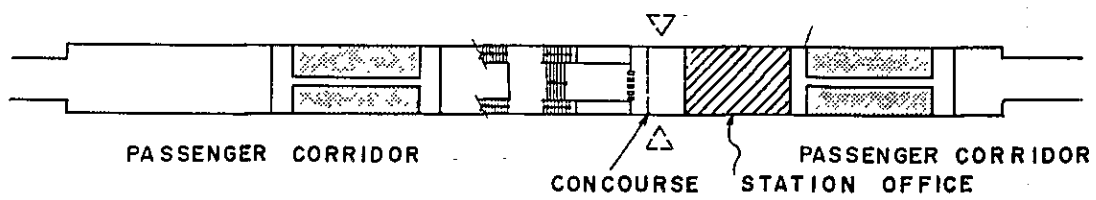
Concept on Station Facilities Under Track Elevation (Gambir Station)
